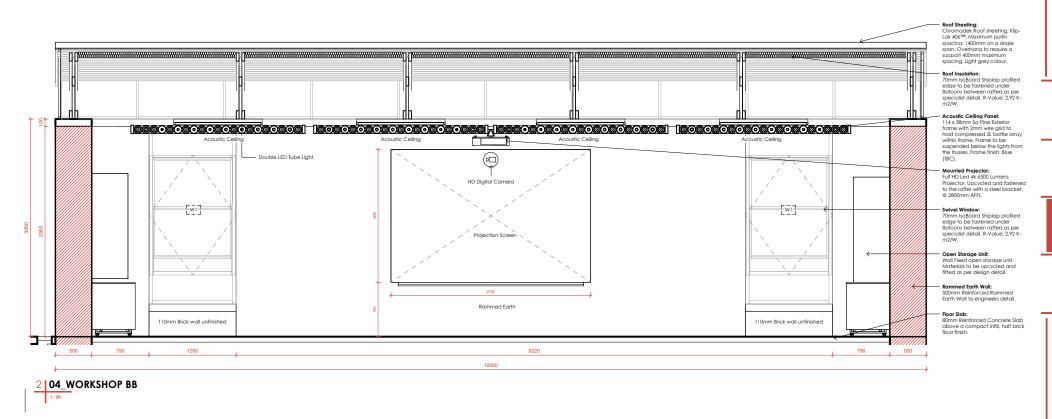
Workshop section 2: section detail interior, (Author, 2021)
